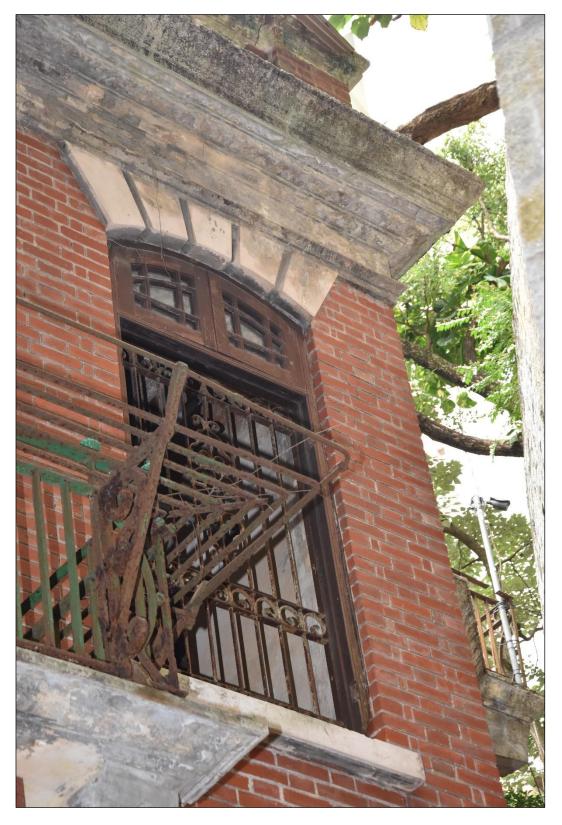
North-west elevation (facing Admiralty side), first floor, window Wdw-1f11, external side, (21st March, 2023)
